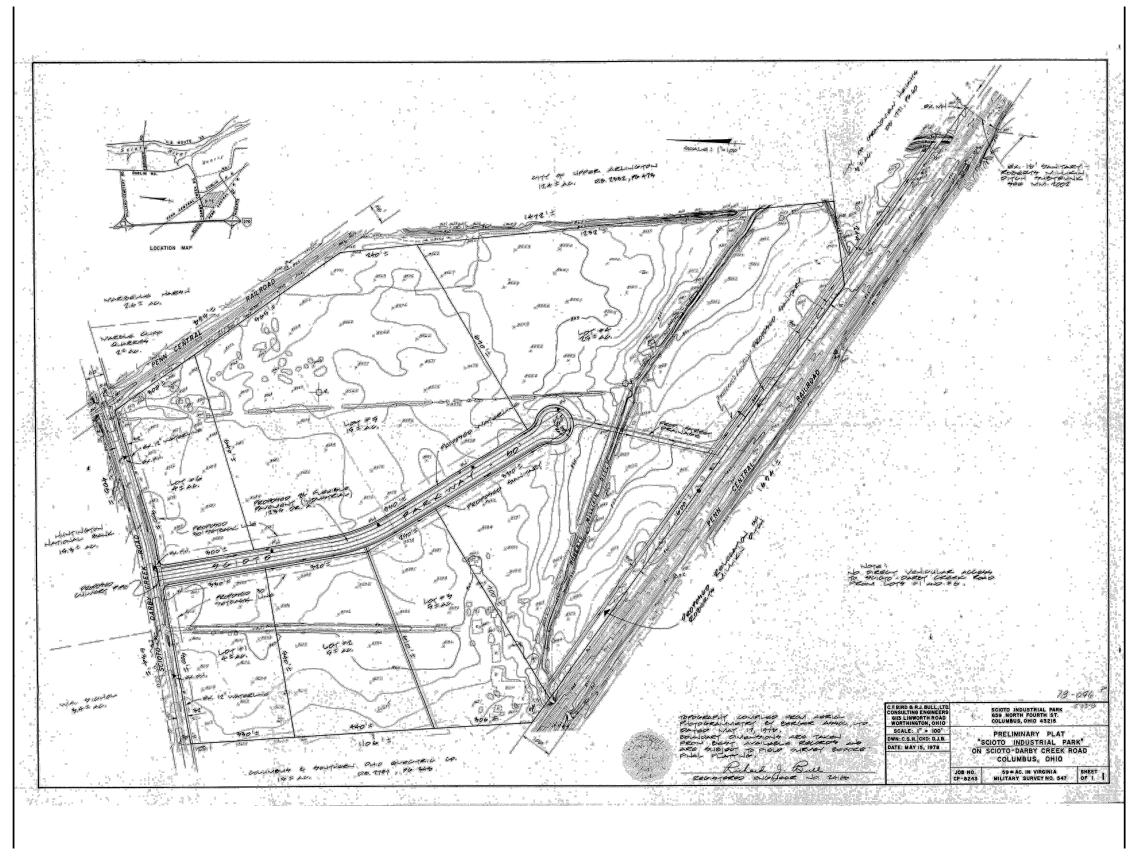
5-15-1978 PRELIMINARY PLAT
